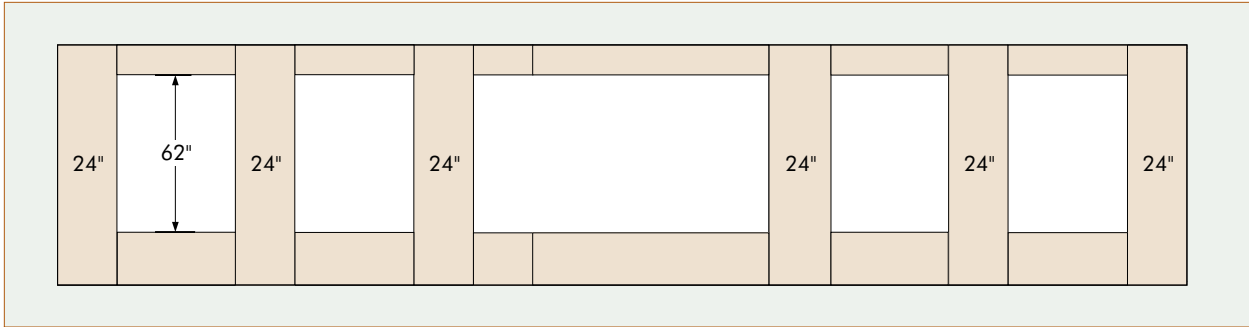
Panel layout detail of east wall for Tests 5a, 5b and 5d. Test 5d had an 800-lbf hold-down device at the corners of the house.
